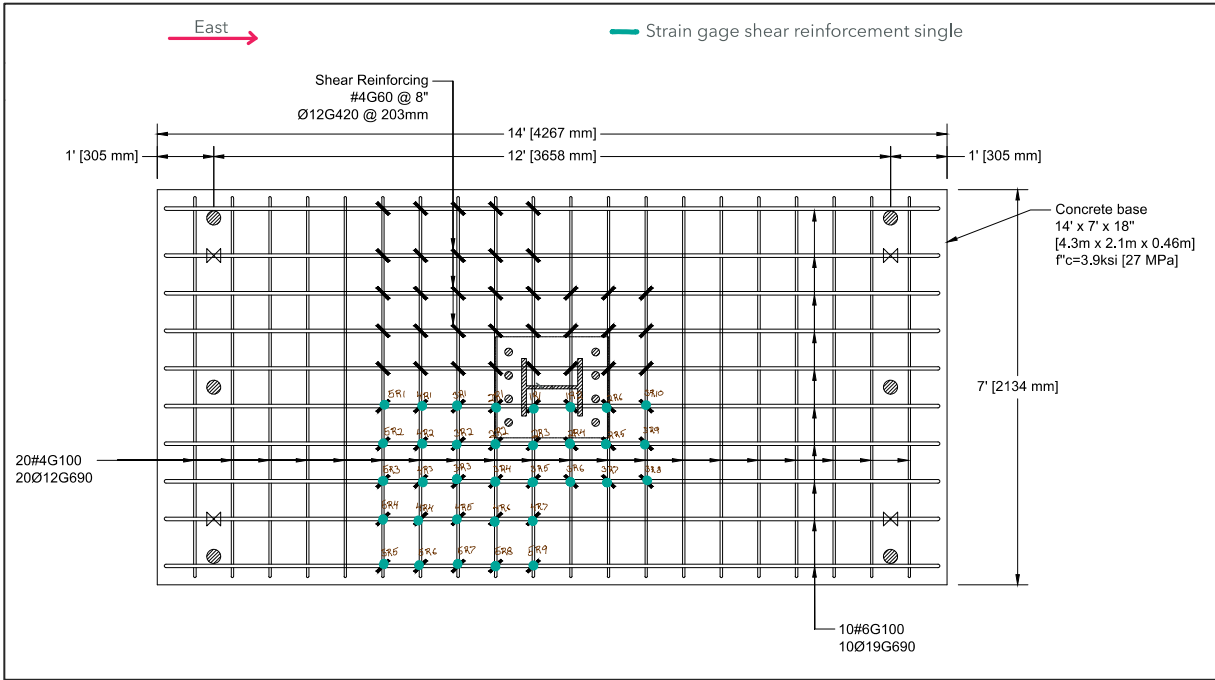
Plan view of shear reinforcing strain gages specimen M02
